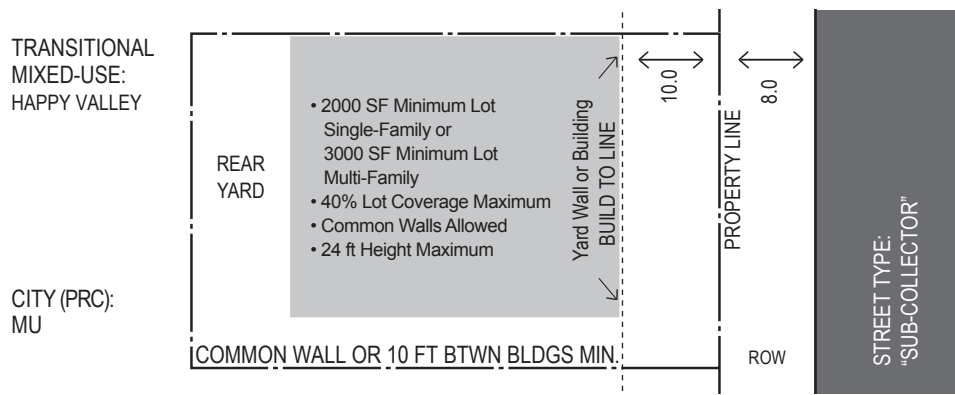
15: TRANSITIONAL MIXED USE - LOT PLAN DIAGRAM
